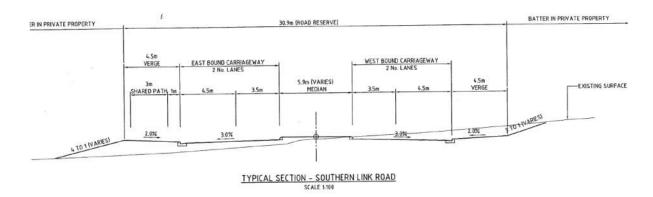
Southern Link Road Typical Section (source: Broader Western Sydney Employment Area Southern Link Road Network 60301100-00-FIG-TS-0002)
